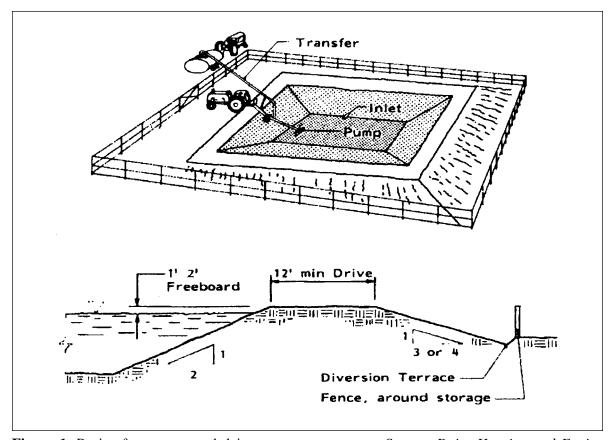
Basins for manure and dairy wastewater storage. Source: Dairy Housing and Equipment Handbook, MWPS-7, Midwest Plan Service.
